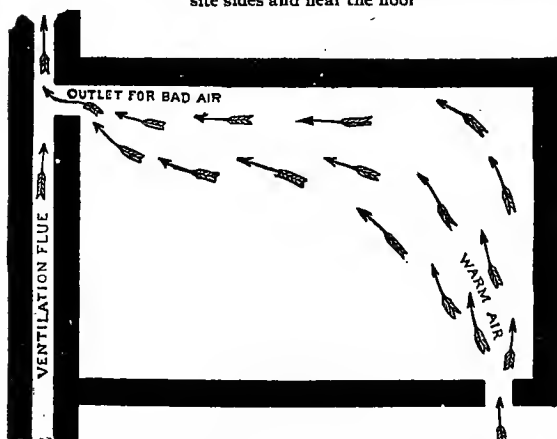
Gravity system, with inlet near the floor and outlet near the ceiling on the opposite side
